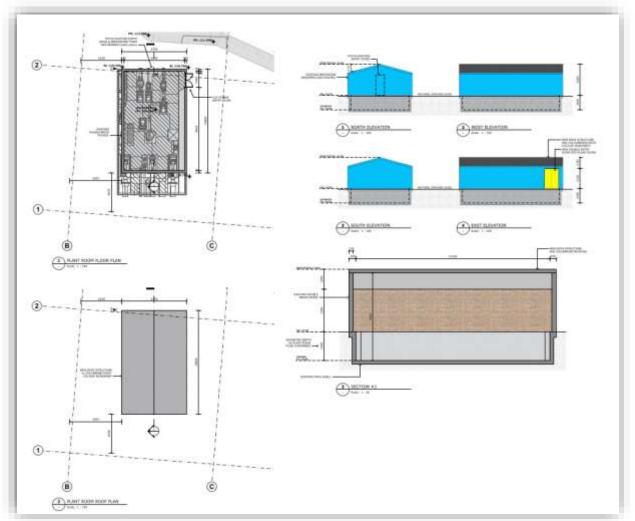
Lower Pumping Station Floor plan, Roof plan, Elevations
